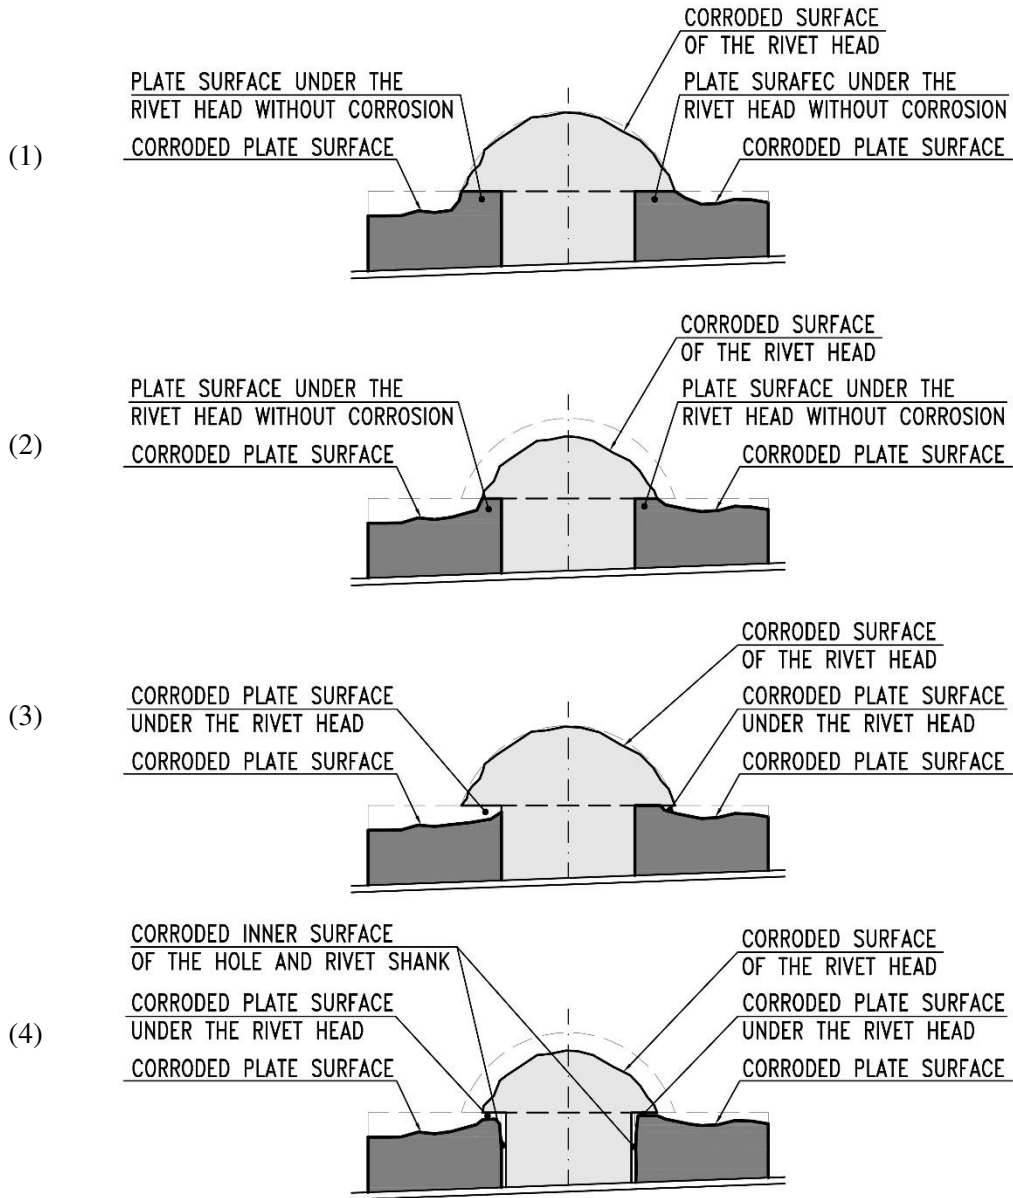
Schematic illustration of corrosion loss in a joint: (1) prestressing in rivet active and mild corrosion weakening of rivet head; (2) prestressing in rivet active and heavy corrosion weakening of rivet head; (3) prestressing in rivet inactive and mild corrosion weakening; (4) prestressing in rivet inactive and heavy corrosion weakening
